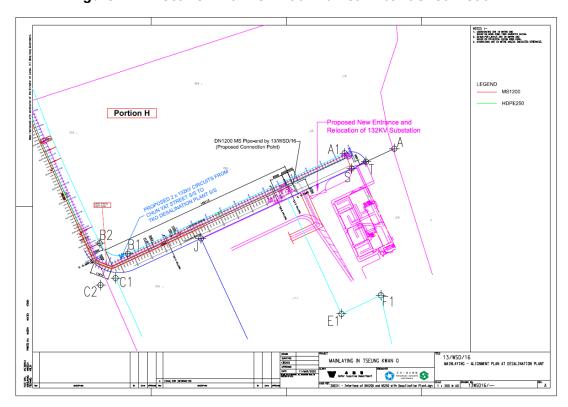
Location Plan for CH.CT 0+07 – 2+58
